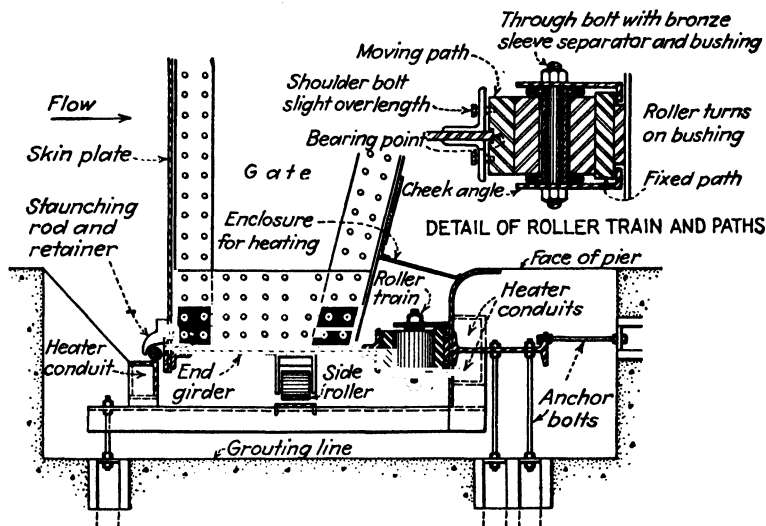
End section of Stoney gate. (From F. Newell, Dominion Bridge Company, Ltd.)
